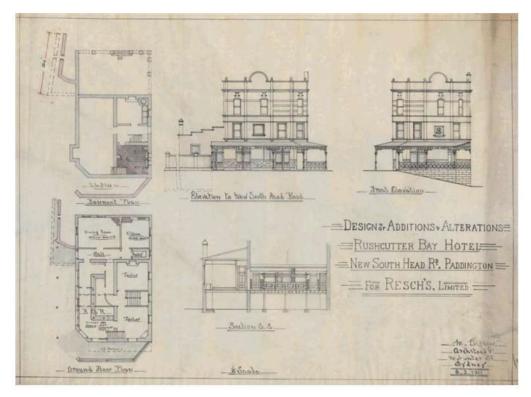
"Rushcutter [sic] Bay Hotel, New South Head Road, Paddington, Design of additions and alterations, basement and ground floor plan, front elevation, elevation to New South Head Road and section, Applicant/owner, Reschs Limited, Architect M Rigden, 70 Hunter Street, Sydney, Signed 30 March 1911". accessed via State Archives & Records https://www.records.nsw.gov.au/image/9590 62949
